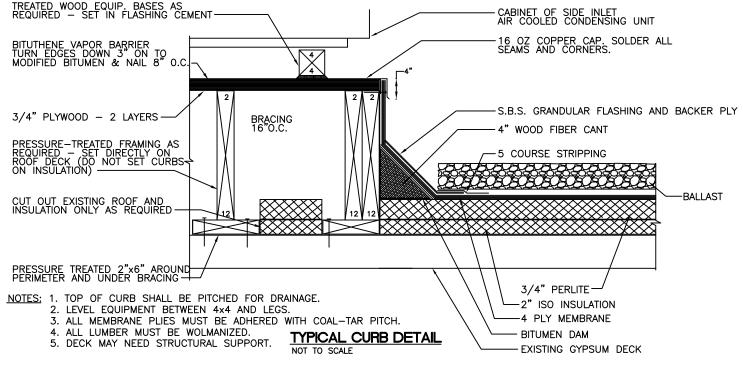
DETAIL GYPSUM et(TYPICAL CURB CONVENTIONAL ROOF/ Typical De
